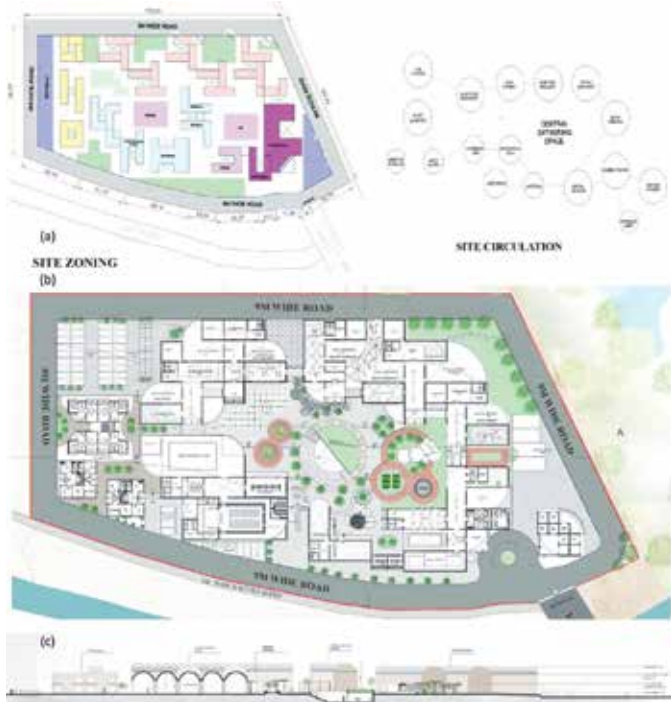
(a) Zoning and circulation (b) Masterplan (c) Site Sections (Sample)
